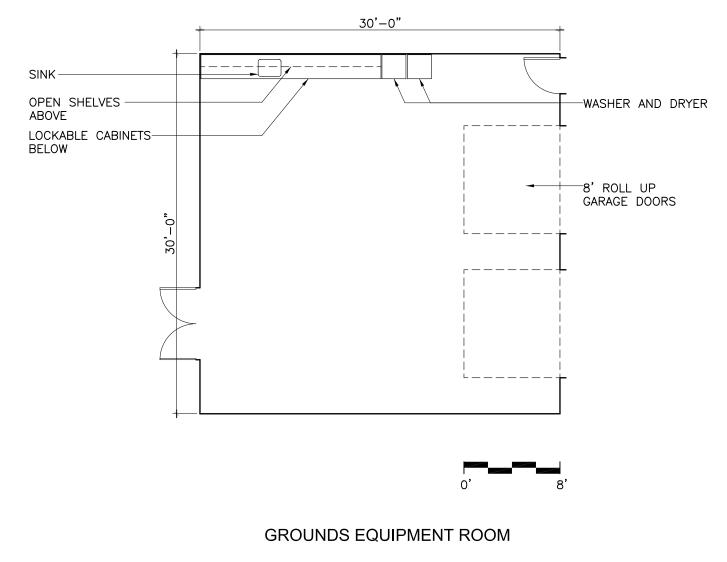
Housing Maintenance Building Maintenance / Grounds Shop Room Diagram
